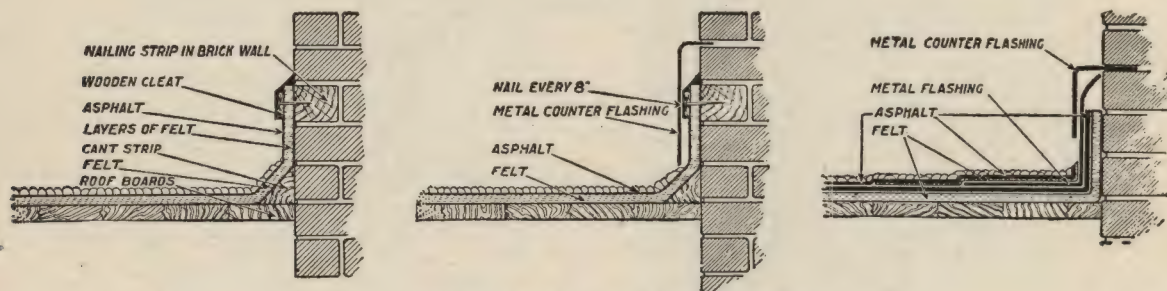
DETAILS OF FLAT ROOF CONSTRUCTION.
